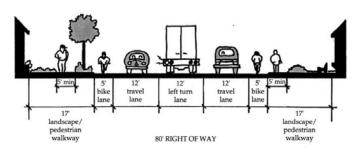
Highway 1 Streetscape Cross-Section Source: Gualala Town Plan (2002)
